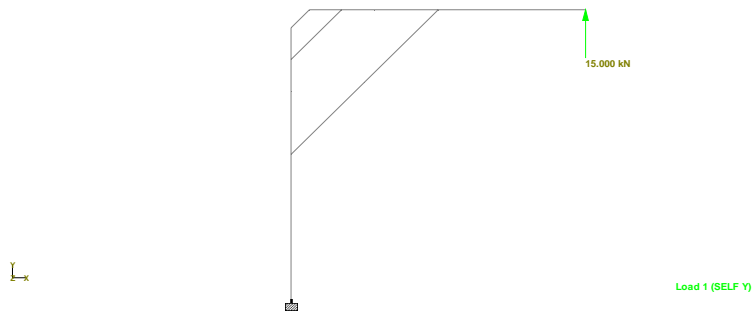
Specimen –D beam column joints for open joints (In Staad)
